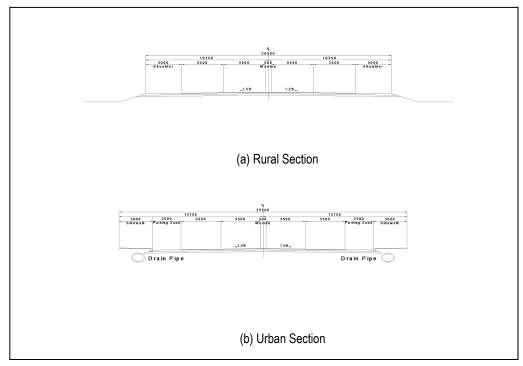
Cross Section of Widening of the NR No.5 and Bypasses
